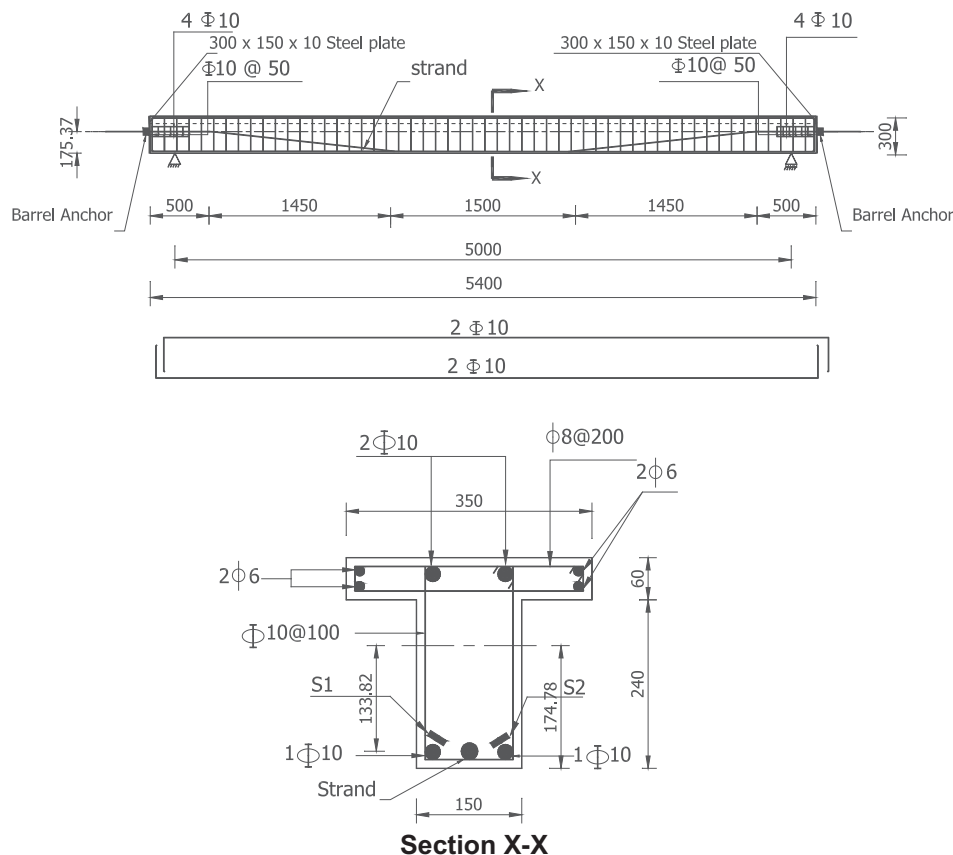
Flexural reinforcement for partially prestressed beams of groups two and three. Typical details for partially prestressed beams of groups two and three.
